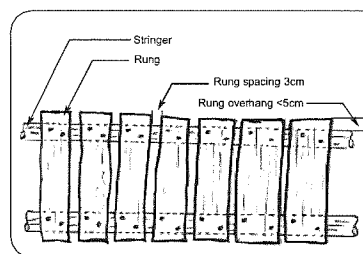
BRIDGE RUNG SPACING. RUNG OVERHANG
